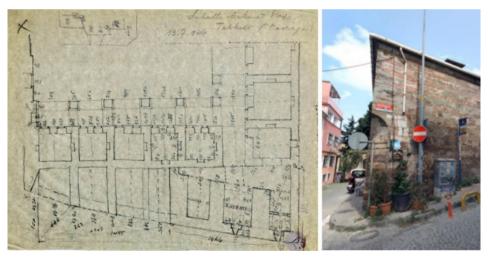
Corner detail of the Sokullu Mehmet Pasha Complex dervish lodge in Kadırga; a) the location of the corner chamfer in plan (URL 24), b) corner detail (Author's archive, 2020)
